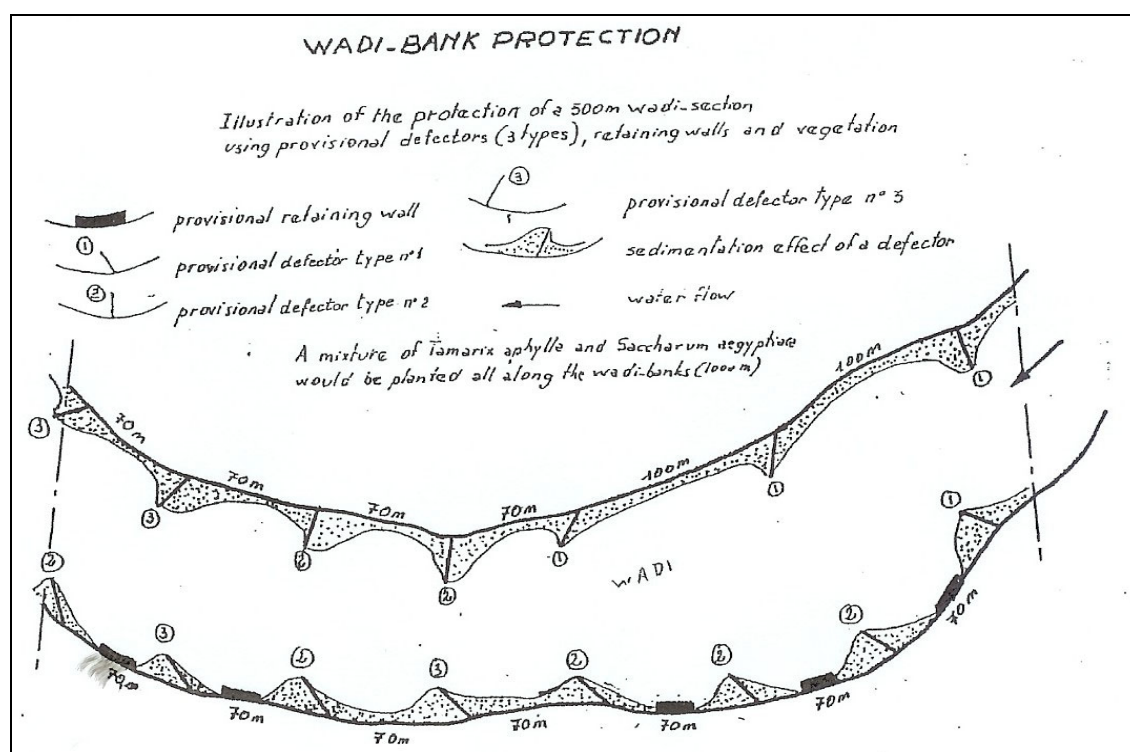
Proposed bank protection using retaining wall and spurs with shrubs
